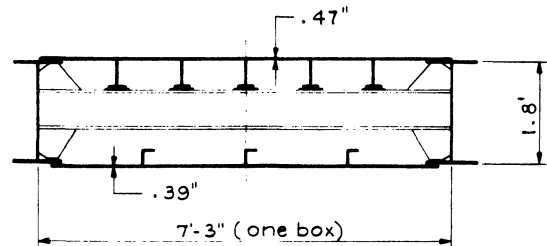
Highway bridge over R. R. on Nanterre-La Garenne Rd., France. Spans 55 ft-38.25 ft-55 ft. This continuous bridge is composed of several shallow one-piece steel boxes separated by non-rigid ties. The deck is 4-in. concrete laid over a 3/4-in. bituminous surface
